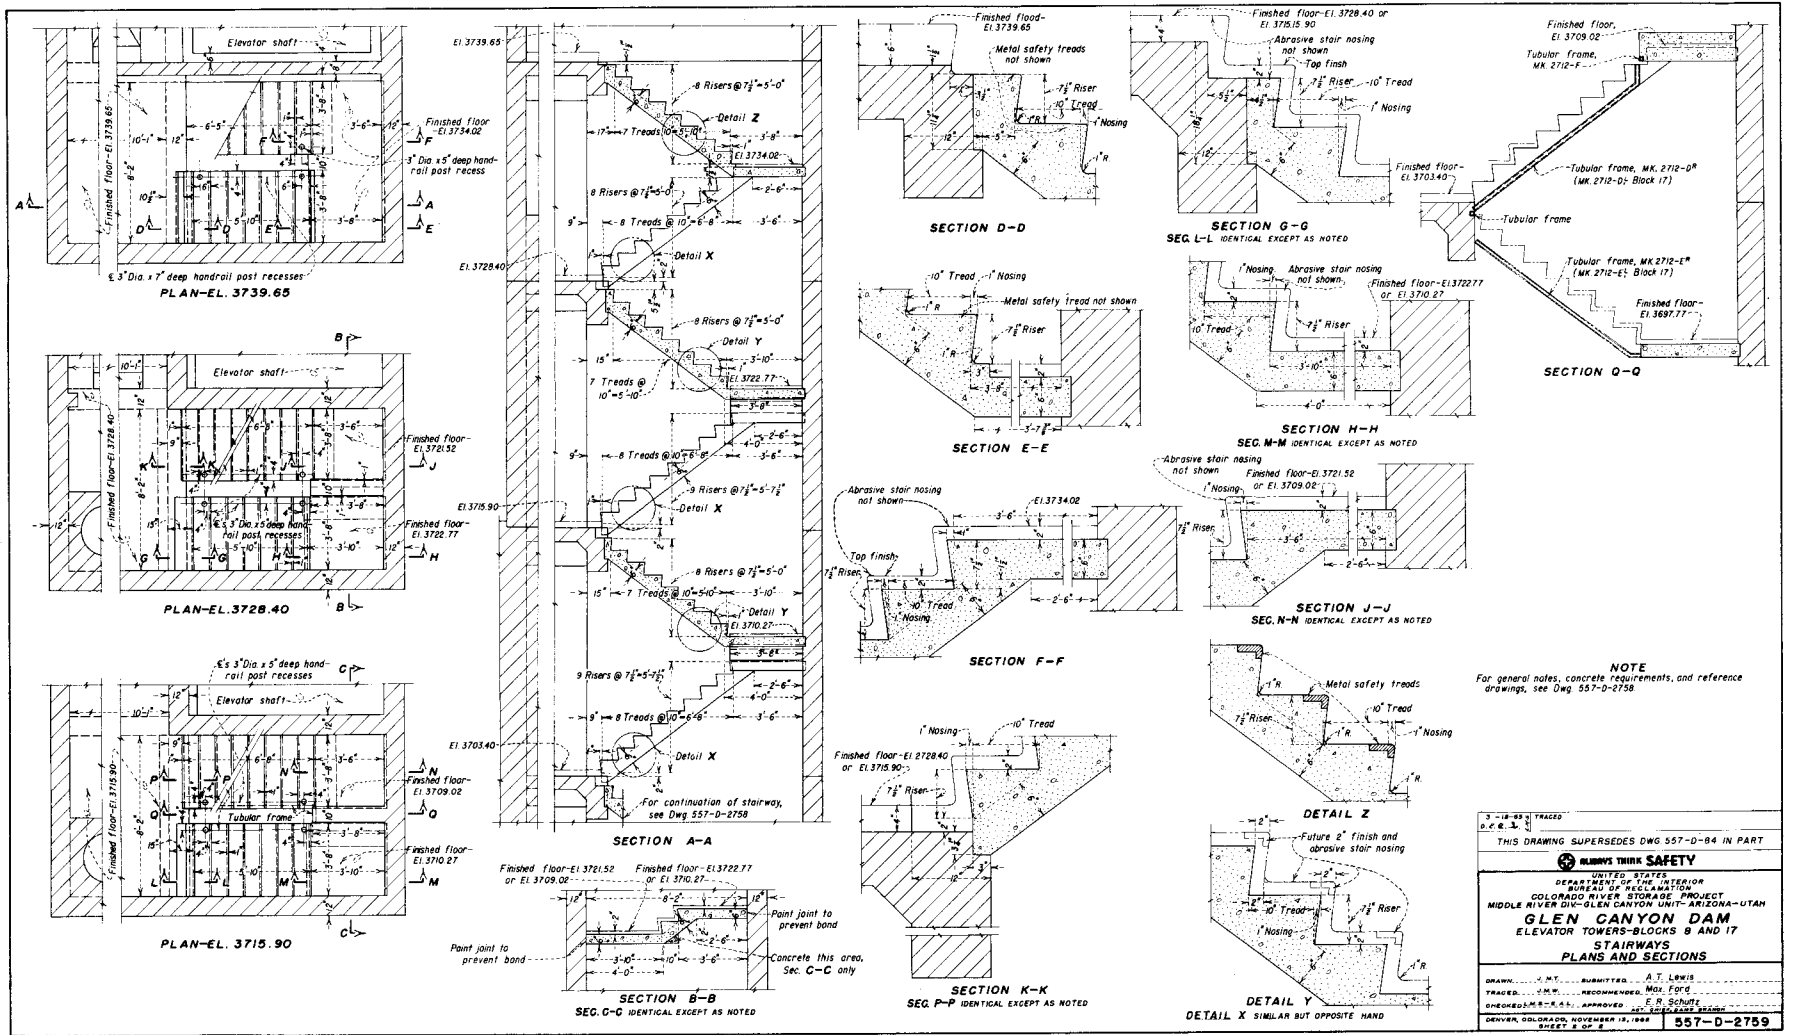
Dam elevator towers, blocks 8 and 17 stairways—Plans and sections. (Sheet 1 of 2.)
